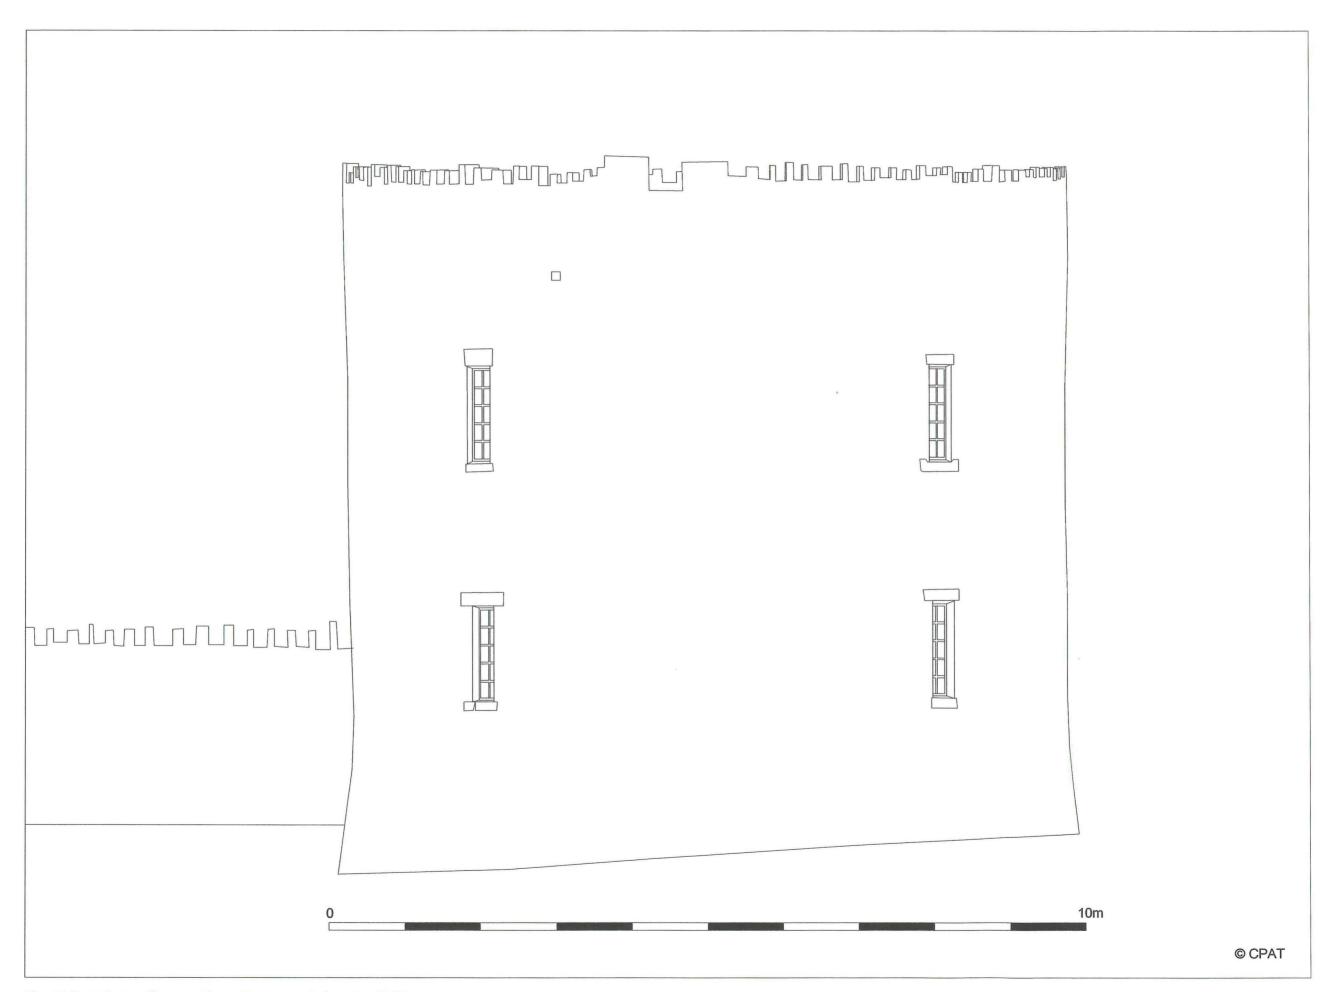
Roundhouse Farm north-east tower, east elevation (B-B)
